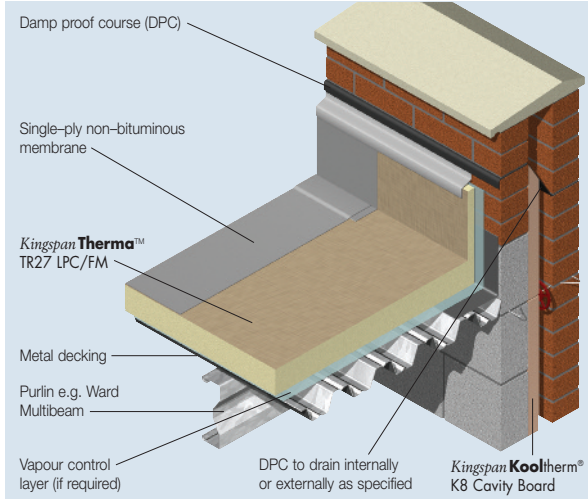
Insulation Installed Above a Metal Deck – Single-ply Membrane
